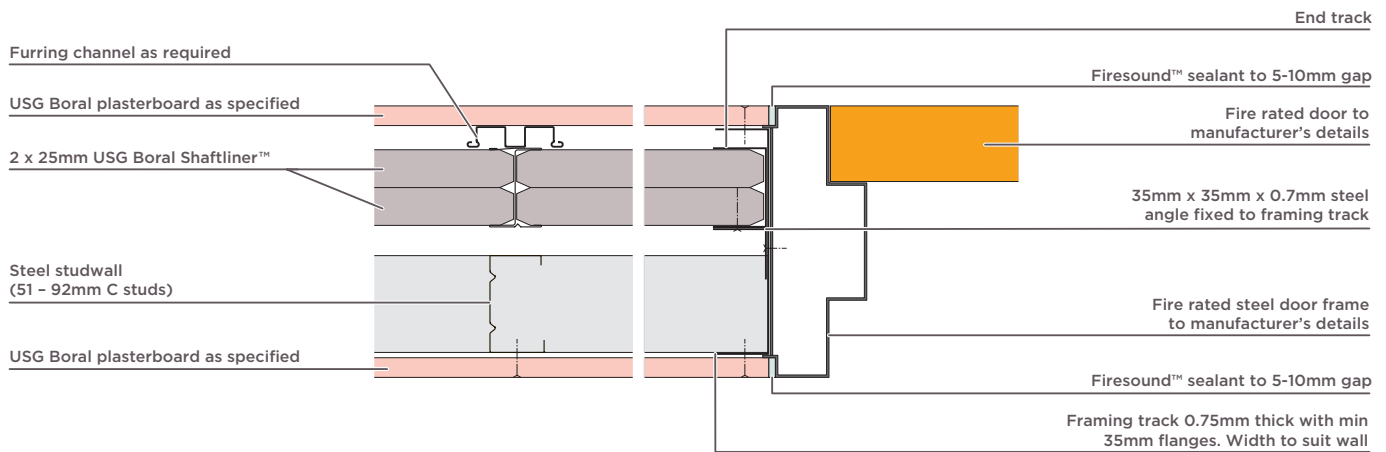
Shaftliner™ Panels to Door Junction Detail 3
